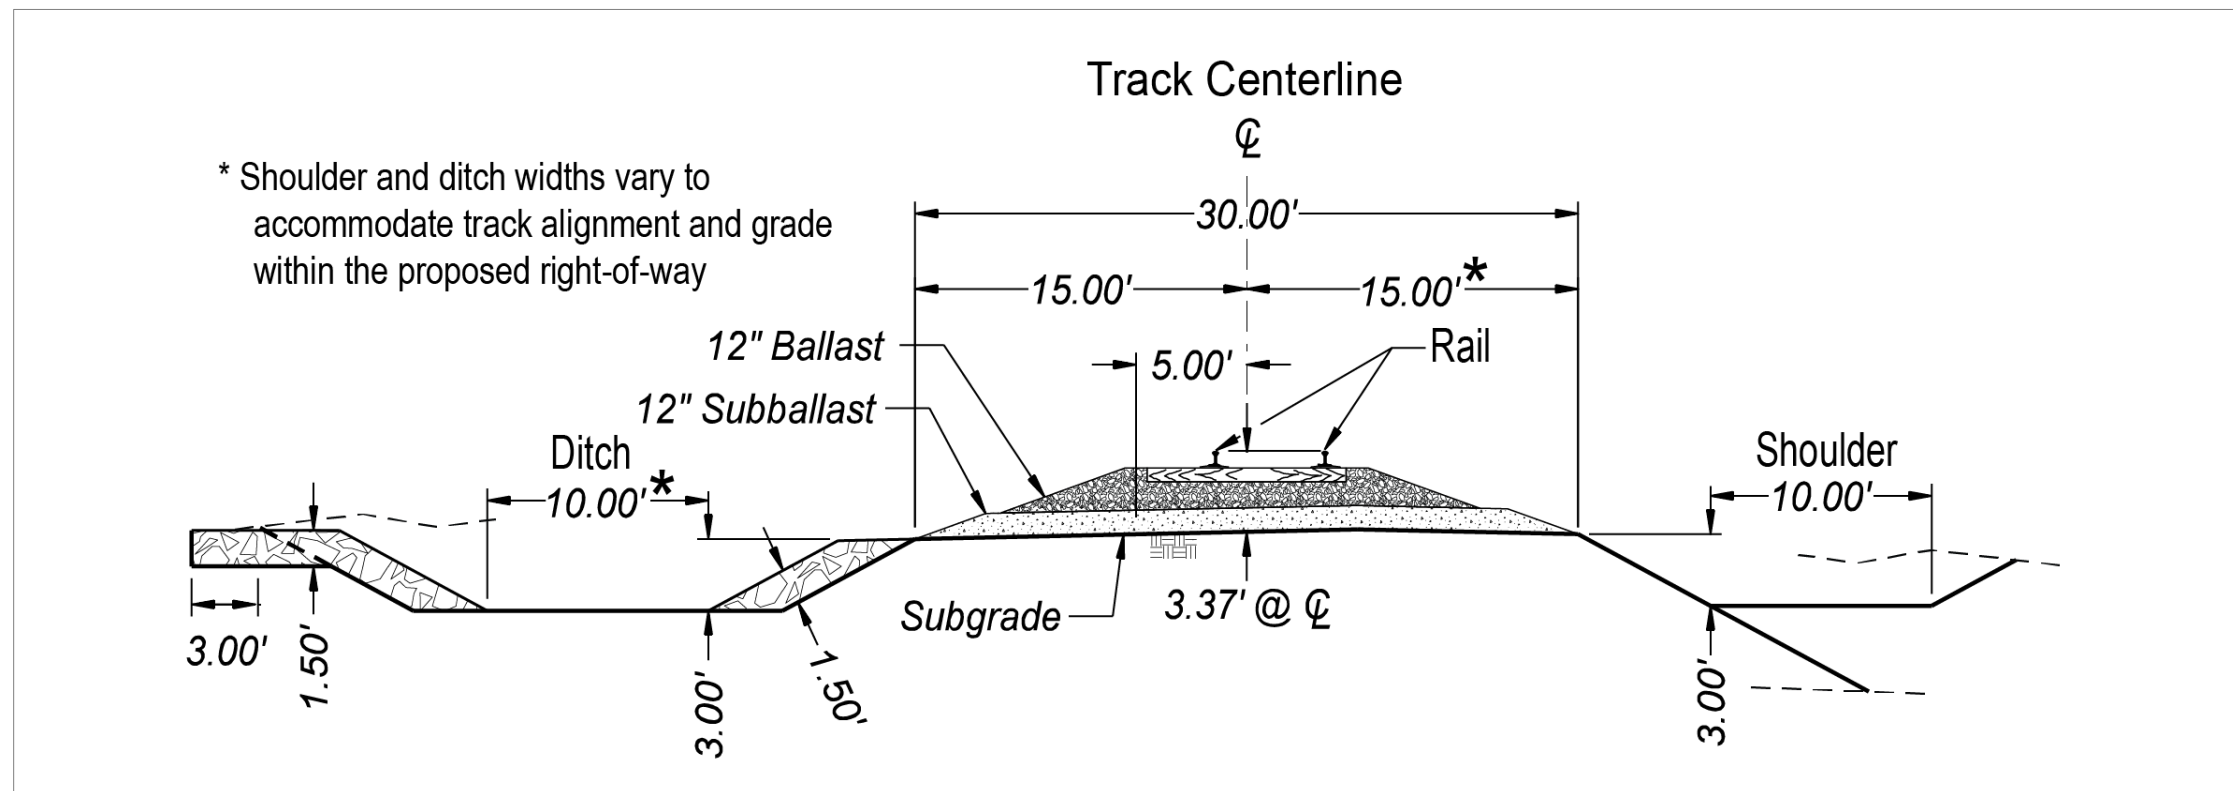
Representative section of a single-track segment paralleled by an access road and drainage ditch
